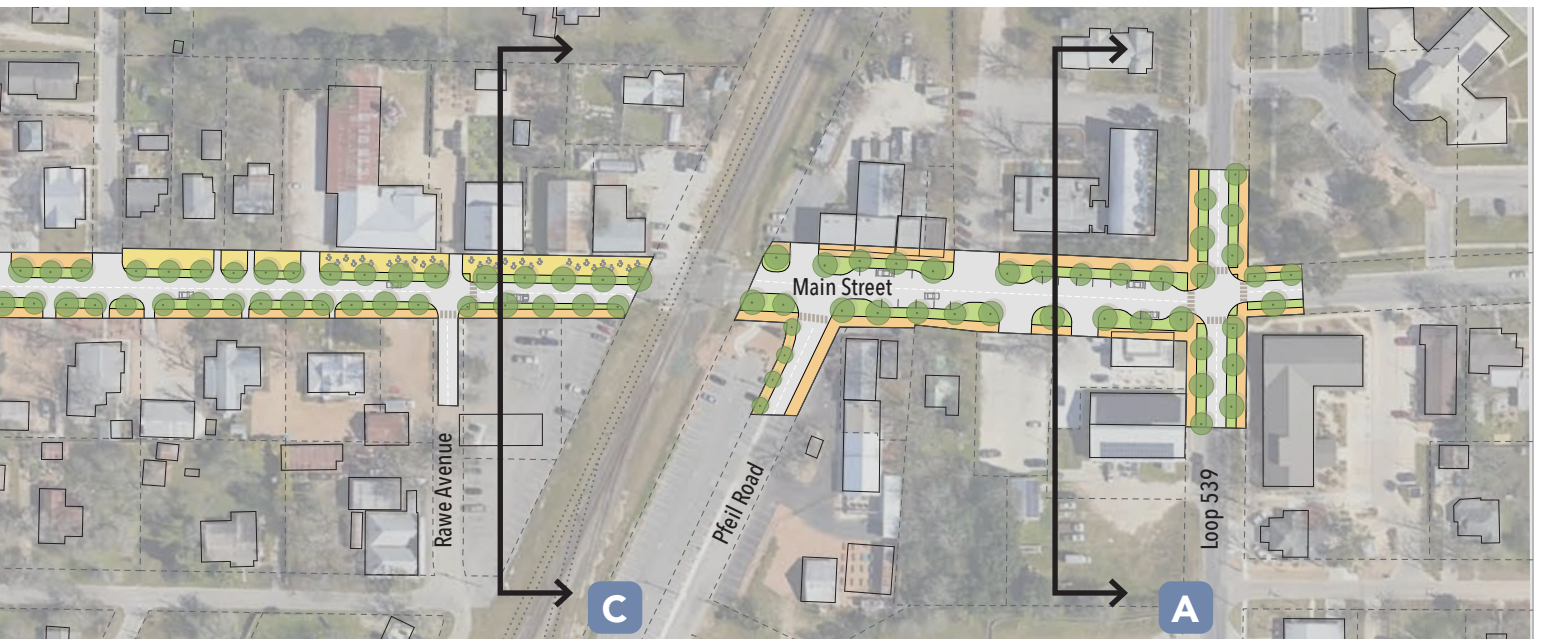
Old Town's Main Street Design Concept: Overall Plan
